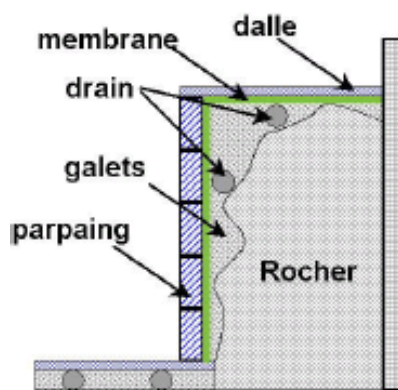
Sub-floor piping installation for a sub-slab depressurization system in France (CSTB 2008).
